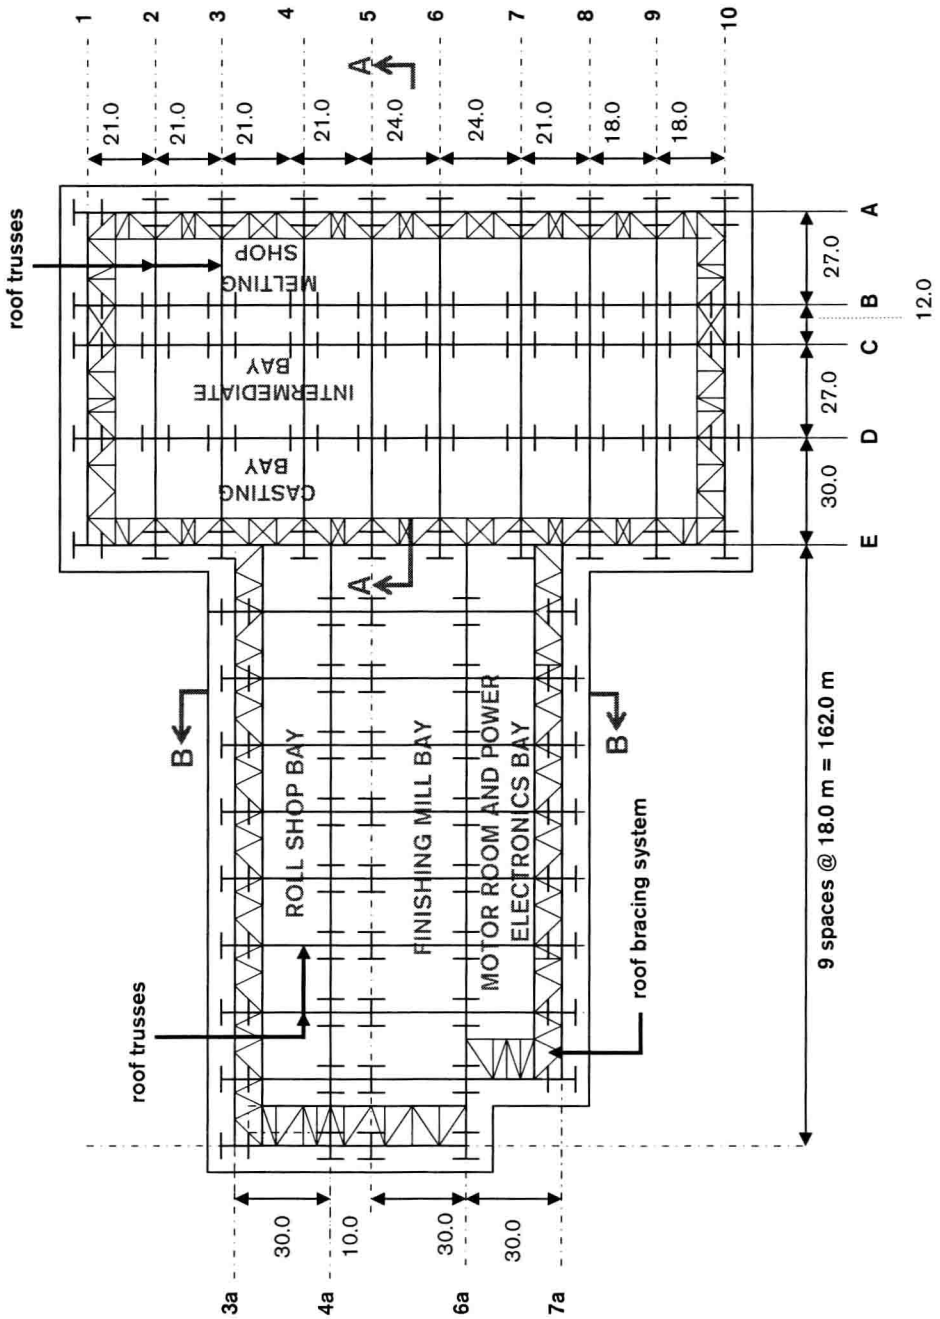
Roof plan (showing roof trusses and horizontal bracings)
